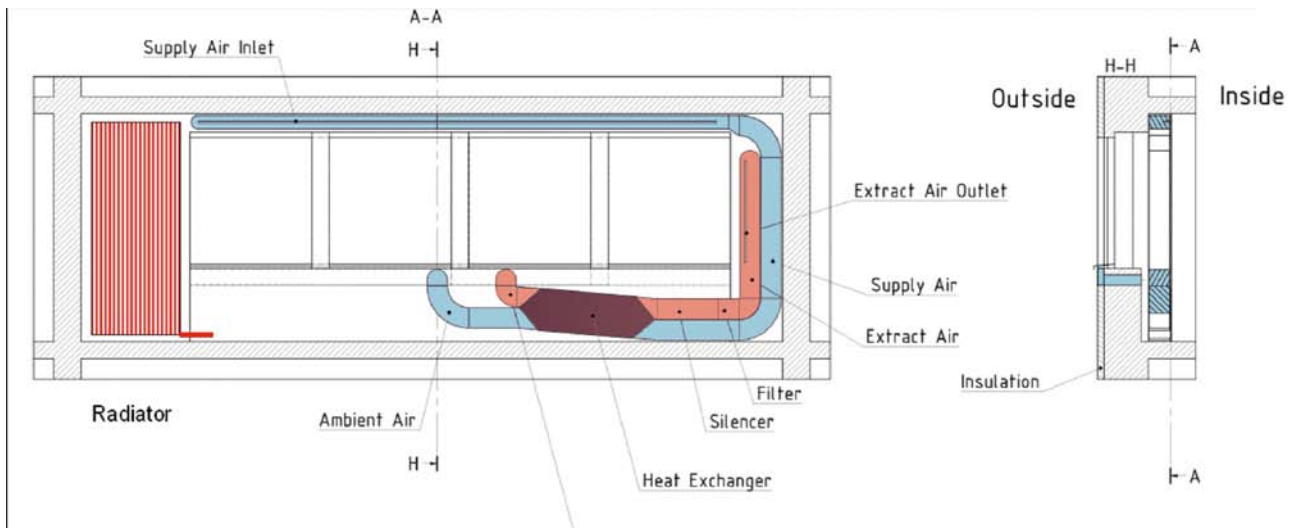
Wall integrated decentral ventilation system for school buildings (supply air inlet at the window lintel, extract air outlet besides the window).
